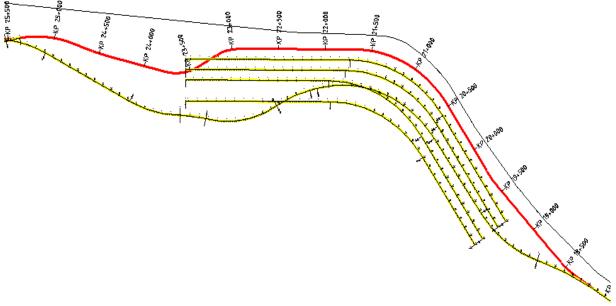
Alternative route options considered for section 6 between KP 16.9 to 25.6
